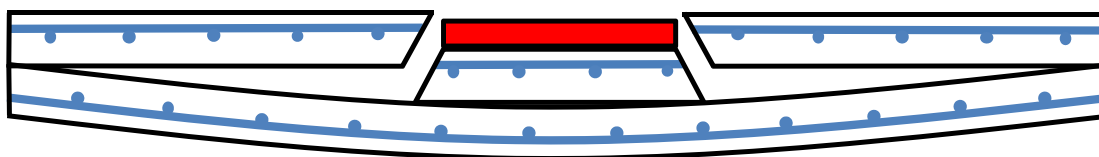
Flexural-Shear Failure of Interior Bridge Deck Specimen.
